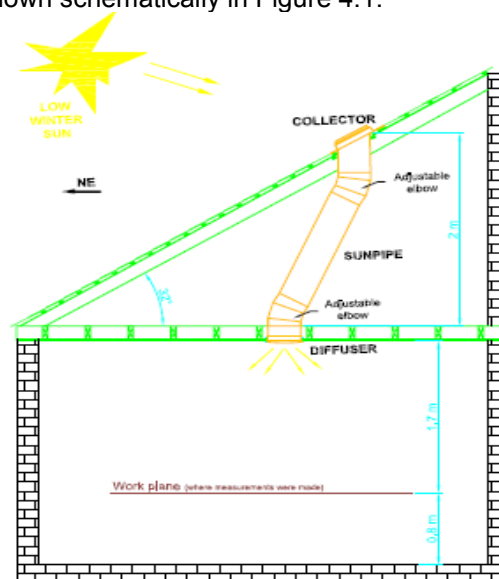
TDGS set-up for a pitched slate roof facing NE
